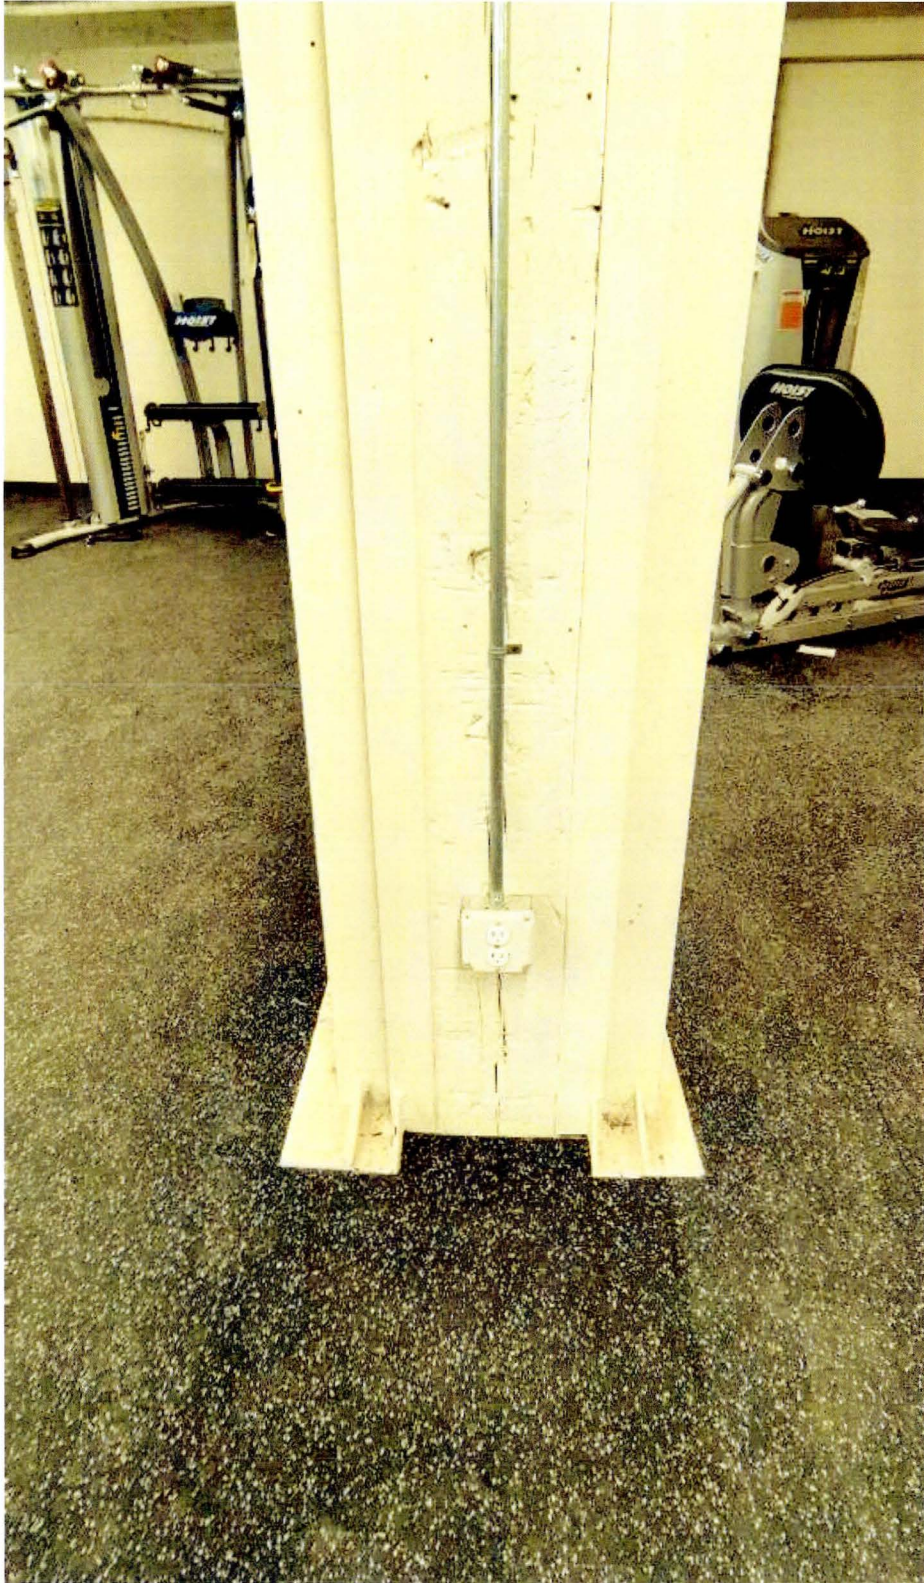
Unit 1037 - Wooden Pillar and cracks in the living room
